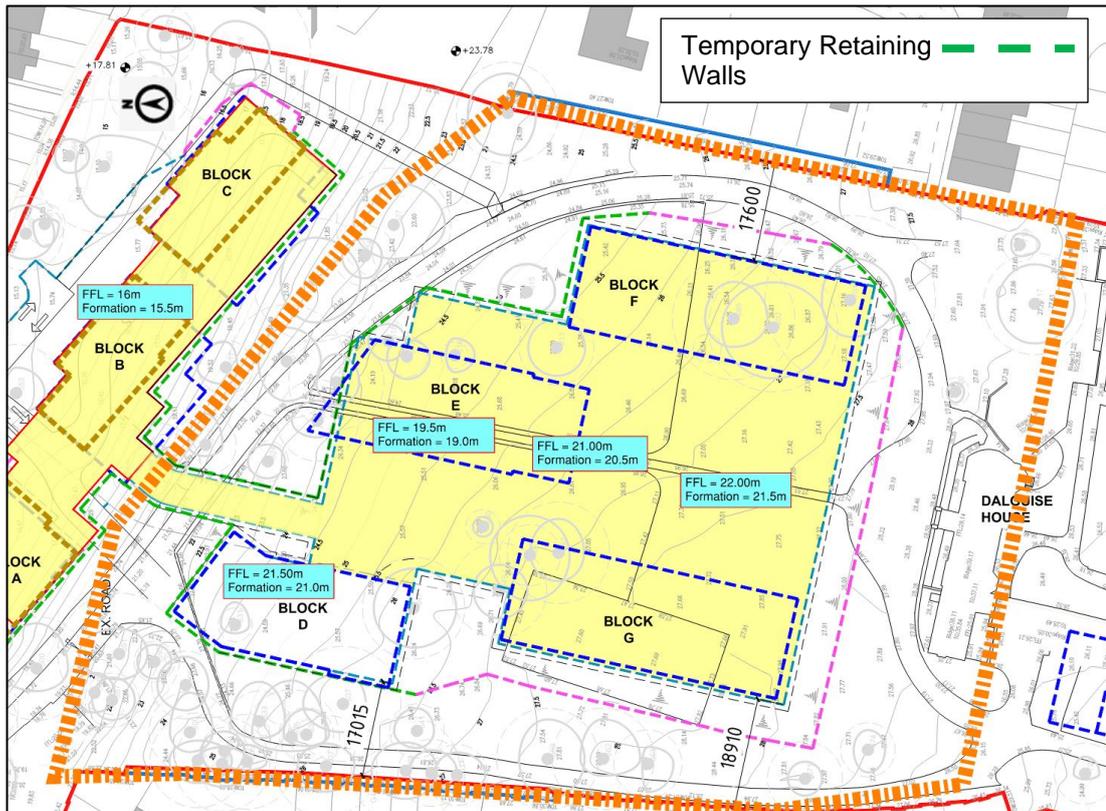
Location of Temporary Retaining Walls (from W3683-DR-1040-02) – Phase 1
